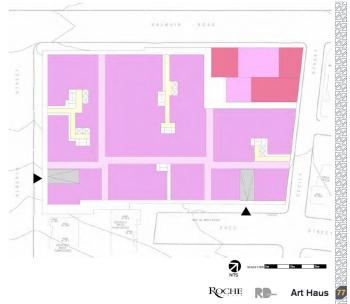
Indicative Floor Plan, Ground Floor – Industrial use level shown in pink shade (taken from Urban Design Report).
